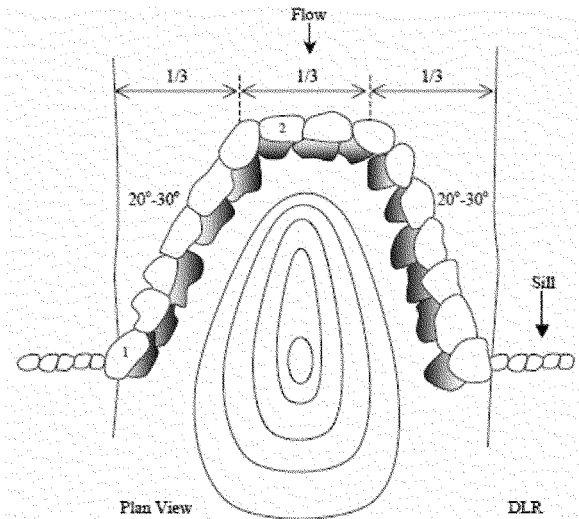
Rock erosion control structures to be constructed in the re-routed Pomme de Terre River Channel.
